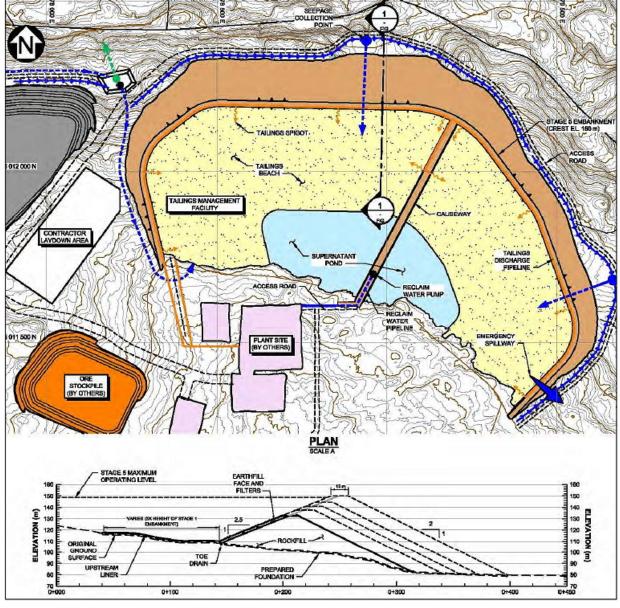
Cochrane Hill TMF: Plan and Typical Section
